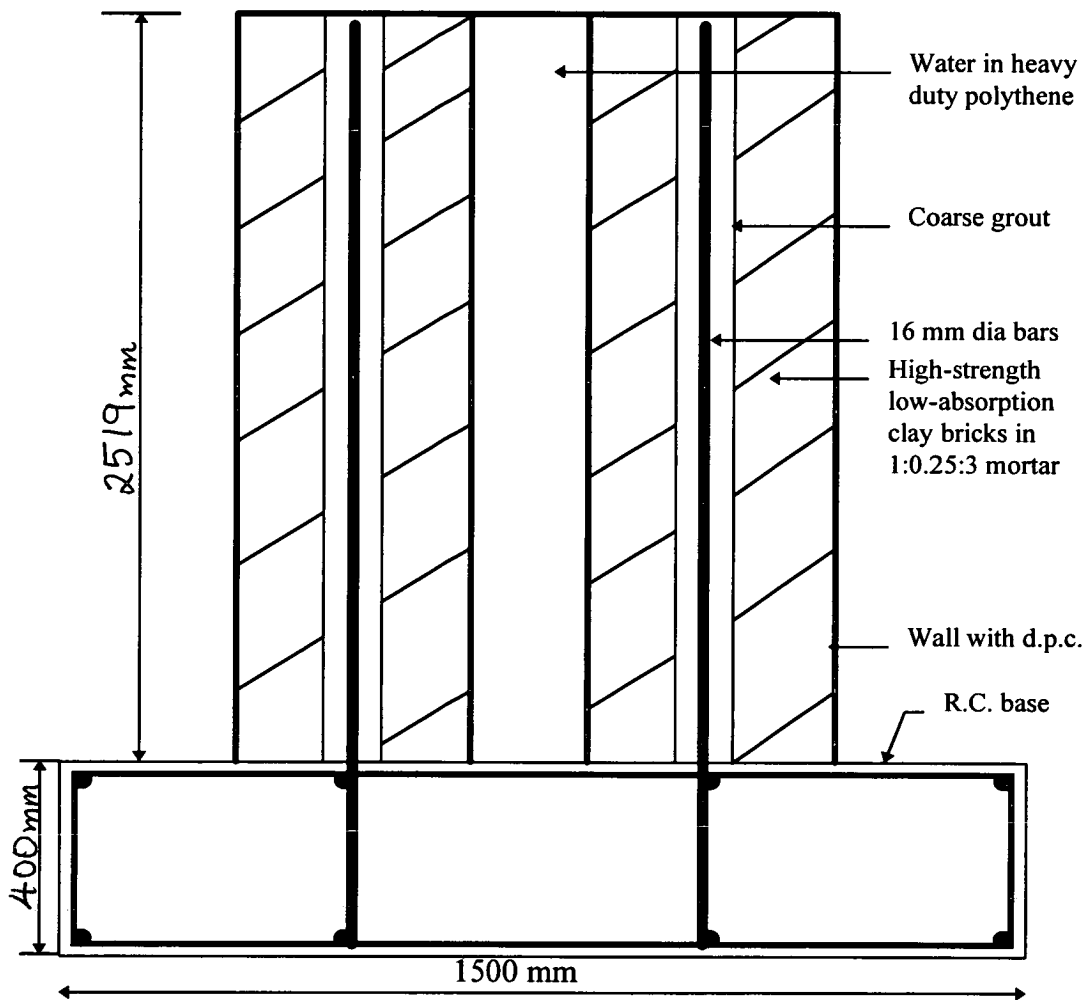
Sinha's Masonry Retaining Wall for Investigation of Creep in Bending<sup>(44)</sup>
